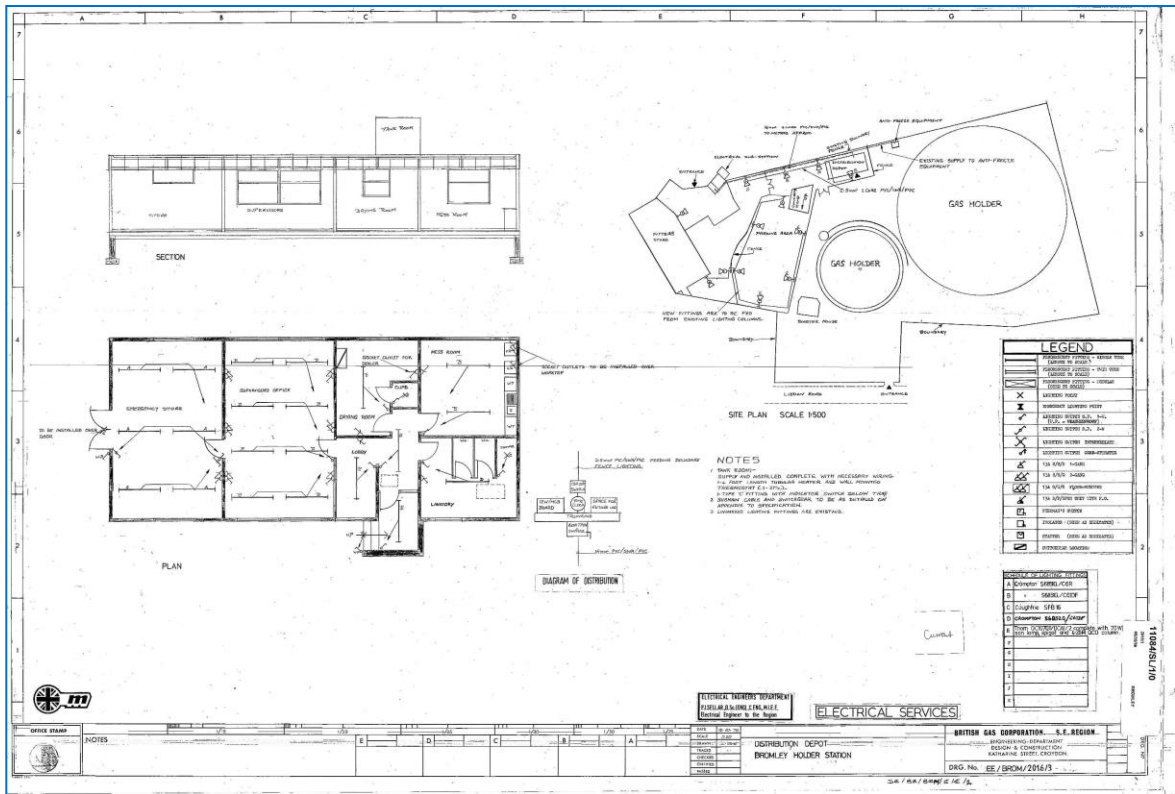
Site plan of Bromley Gasworks and its Holding Station, 1979
